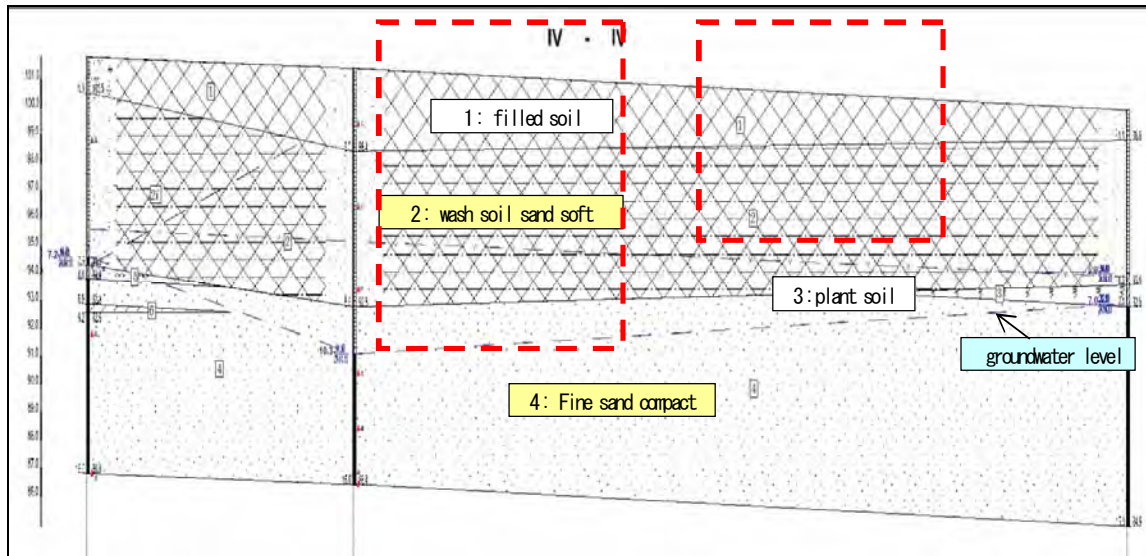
Excavation Area of Sewage Treatment Facility for Block 1
